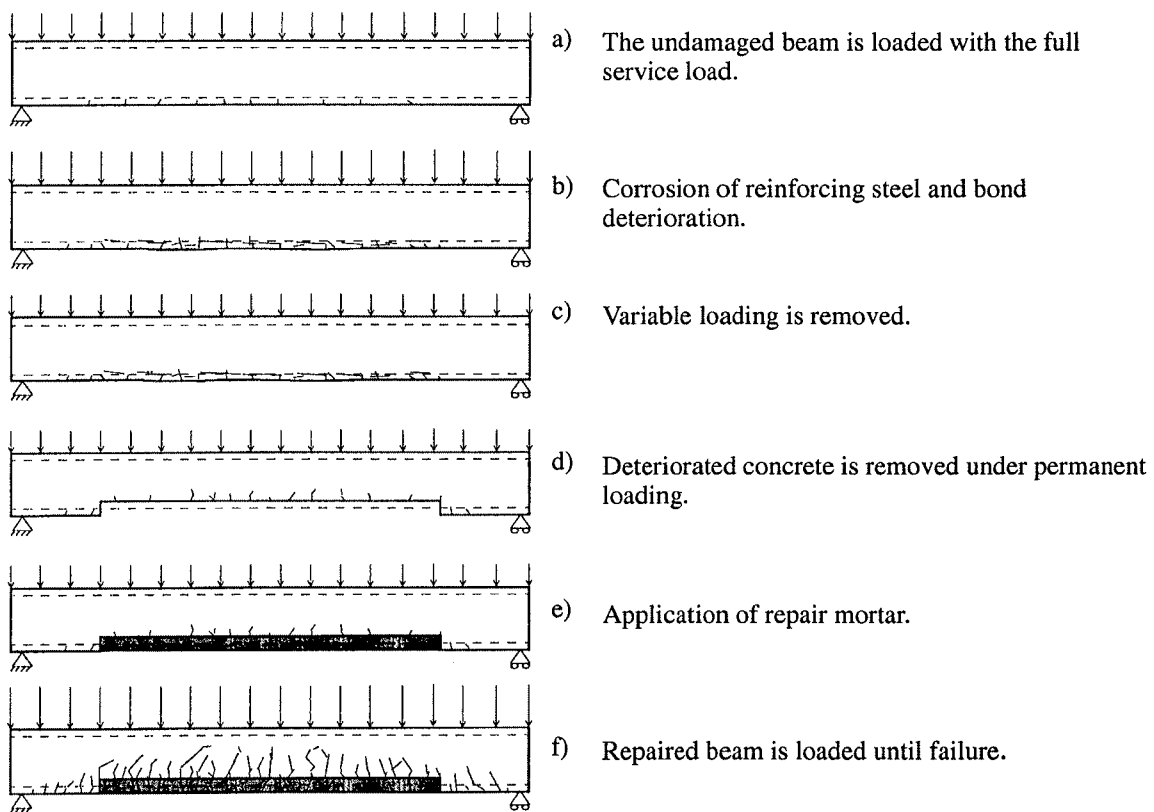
Tracing the deterioration and repair history of concrete beam.
